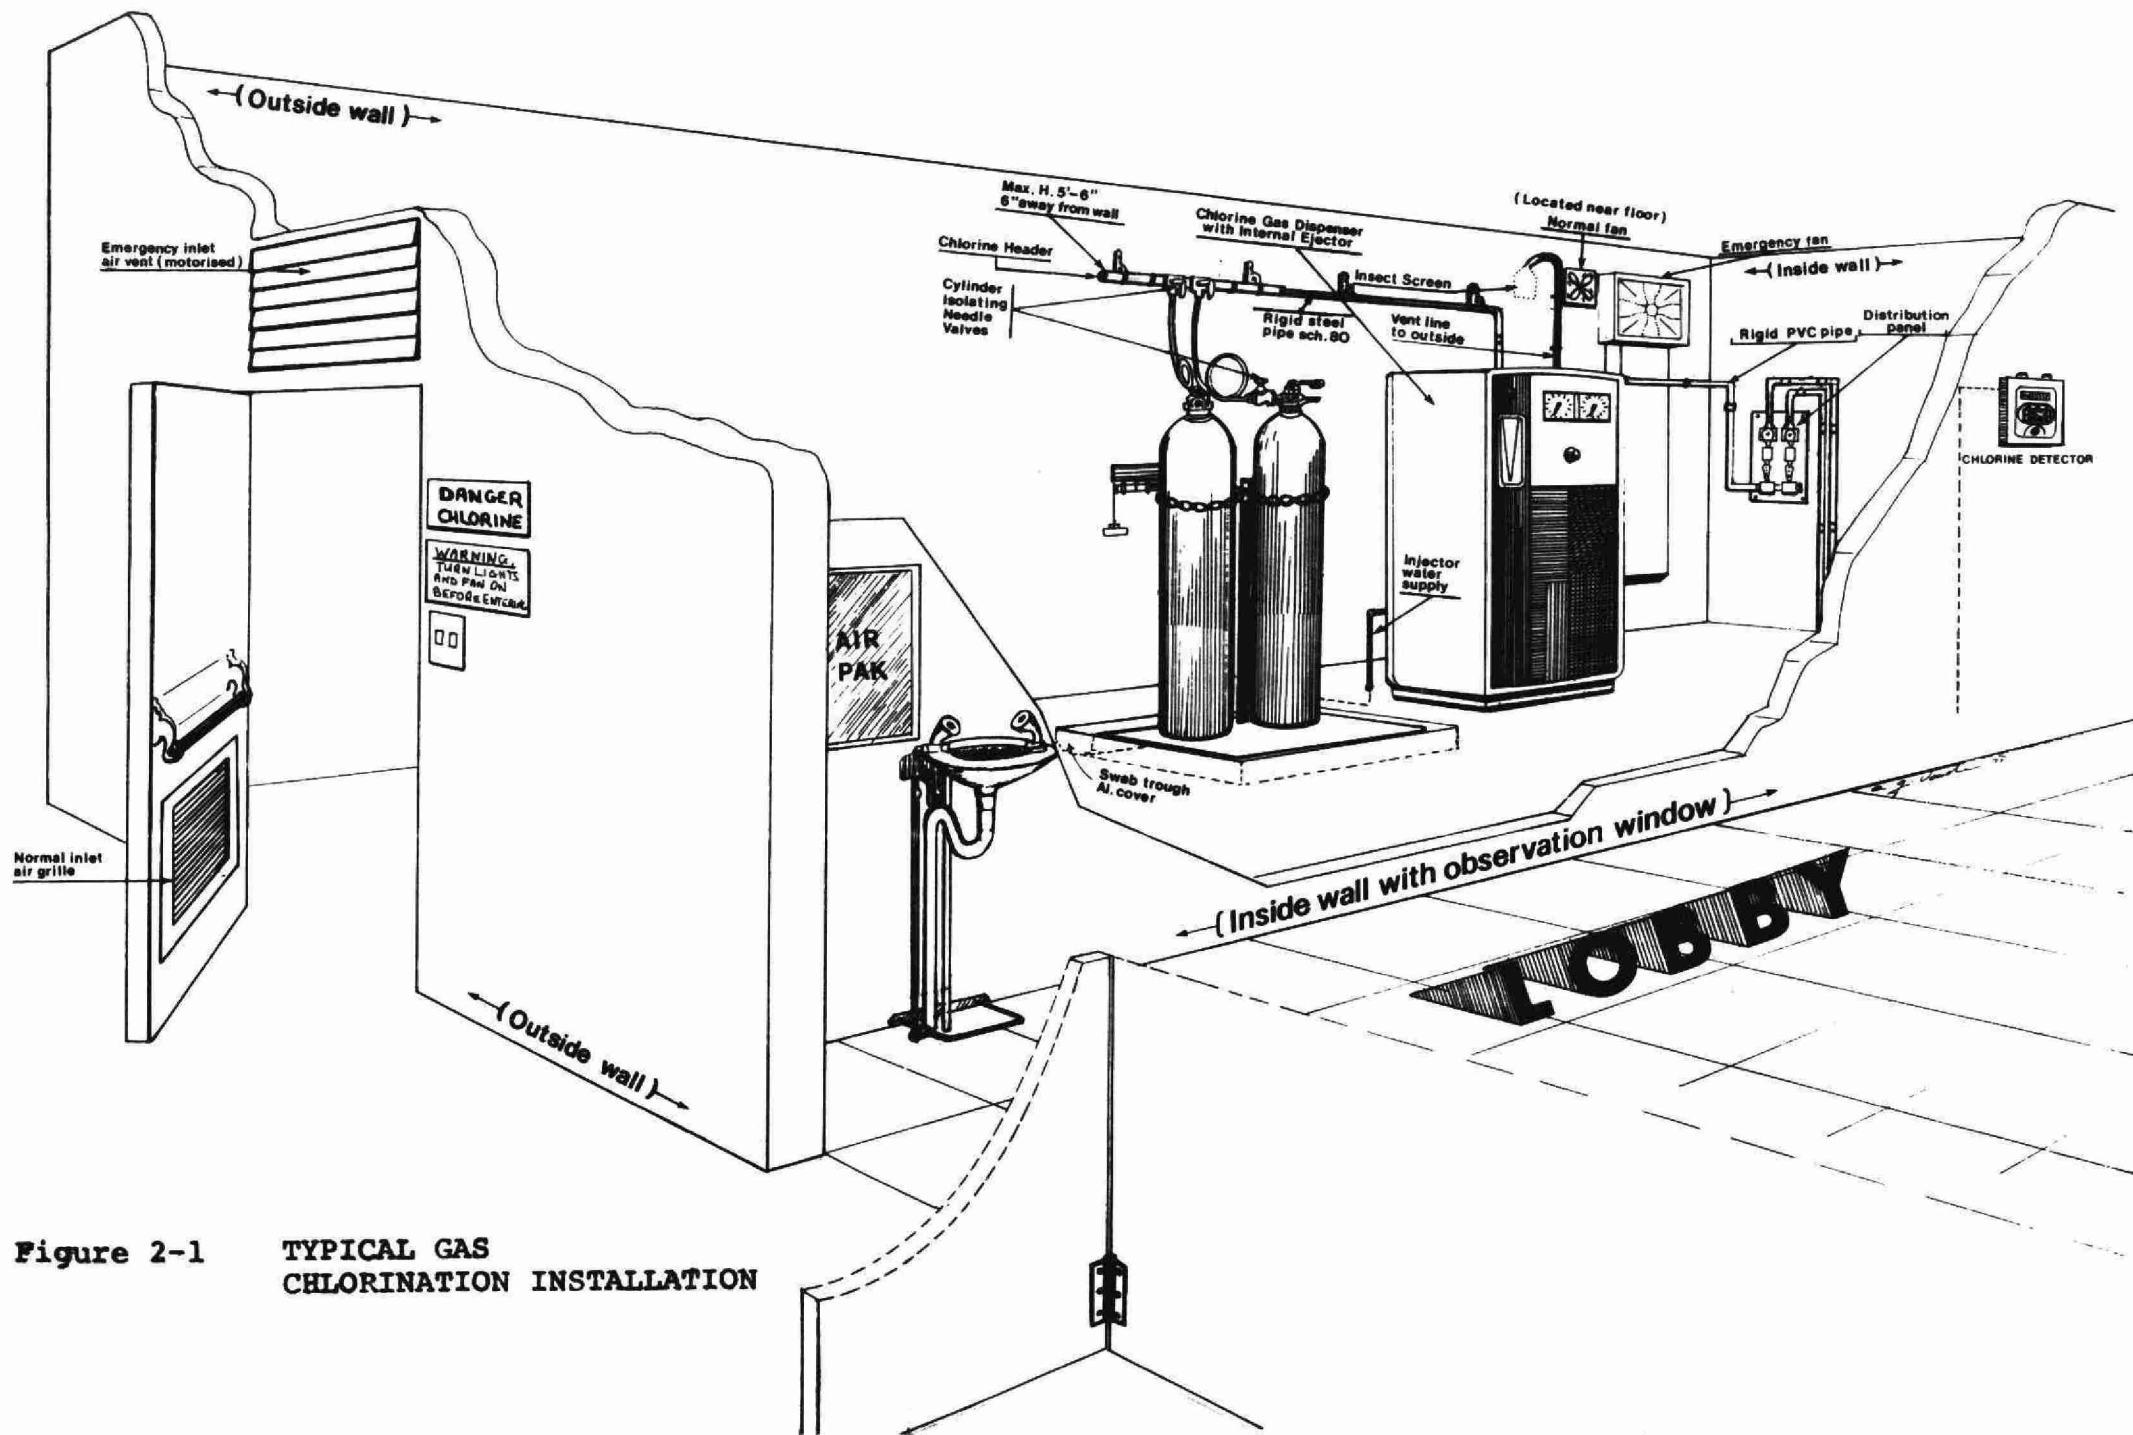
TYPICAL GAS CHLORINATION INSTALLATION
